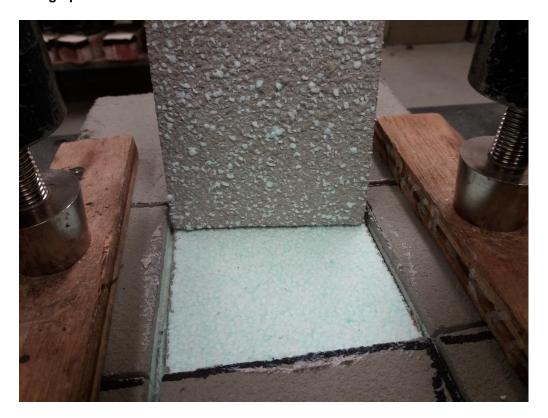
Specimen 1 failure mode between insulation and render.
